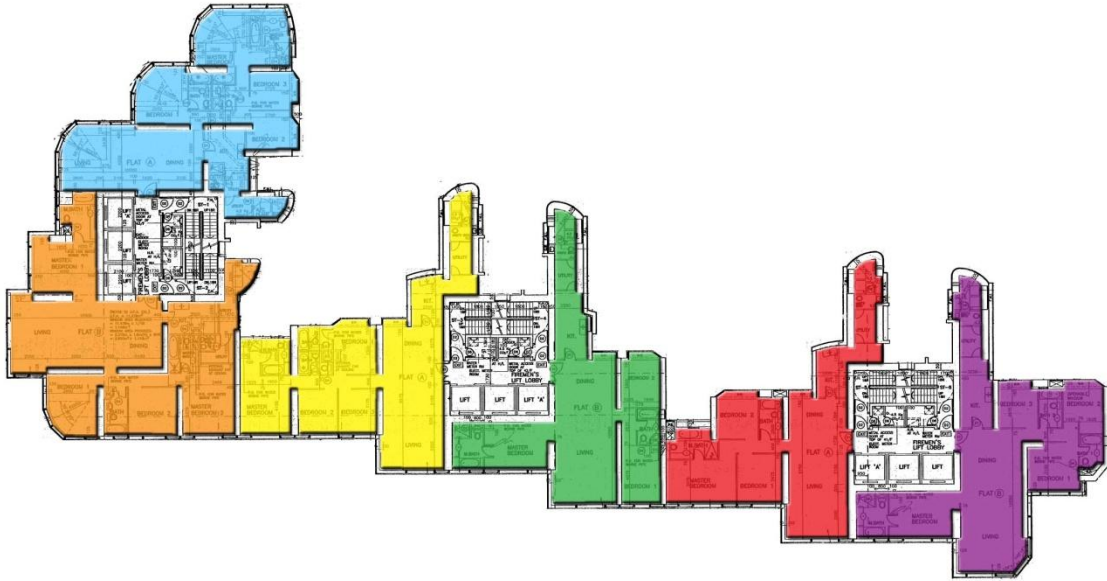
Apartment layout (DLN Architects & Engineers 2001d)
